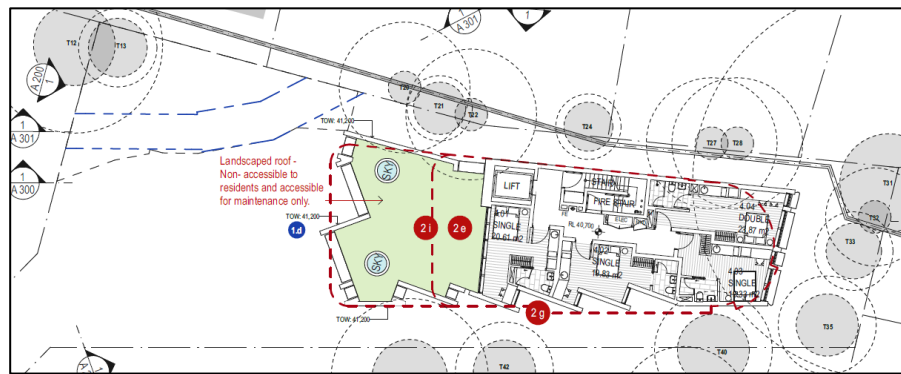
Proposed fourth floor plan (Source: TonkinZulaikhaGreer)
